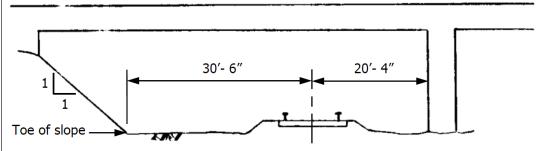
Bridge elevation view indicating horizontal offset for one railroad track below the bridge.
